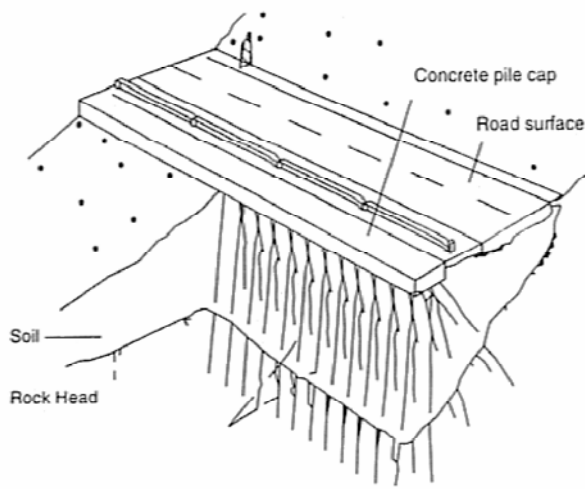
In situ soil reinforcement by reticulated micropile system (Bruce and Jewell, 1986, 1987a)
